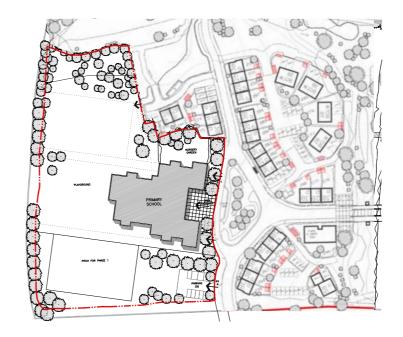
Primary School Plan, Phase 1- 1.34 hectares
